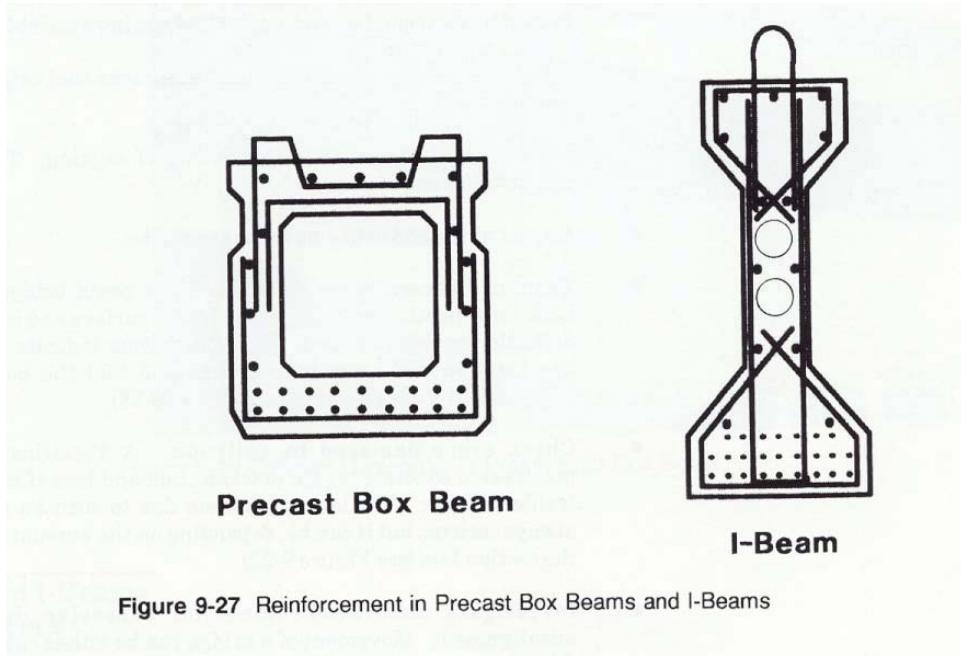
Reinforcement in Precast Box Beams and I-Beams
